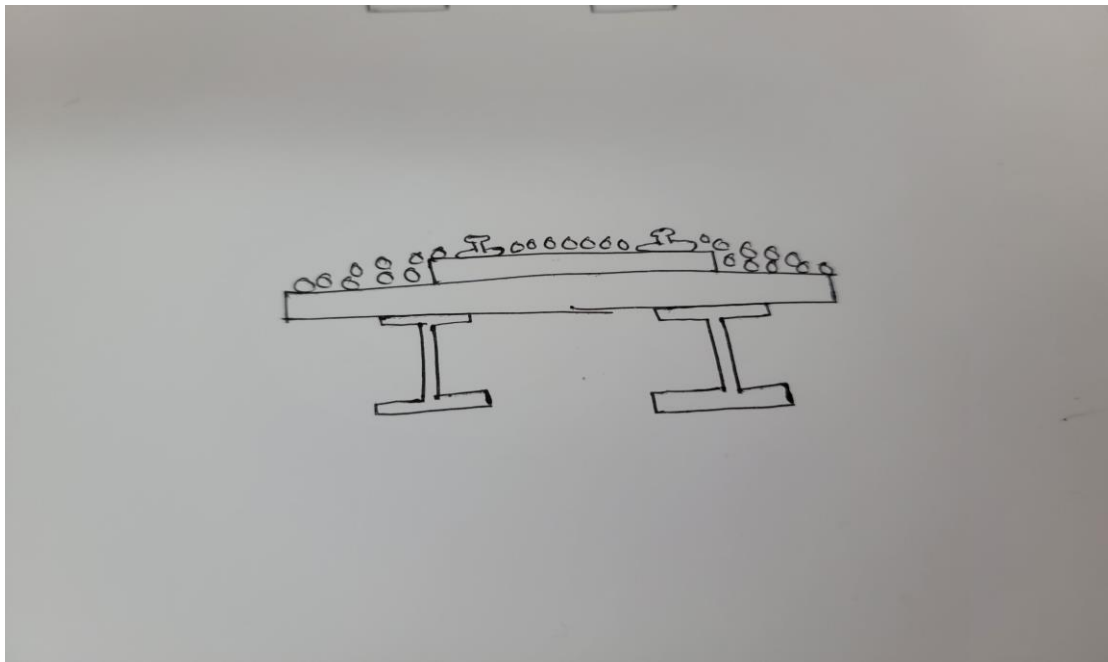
Traditional ballasted track, wooden sleeper with steel girder and prefab concrete deck
